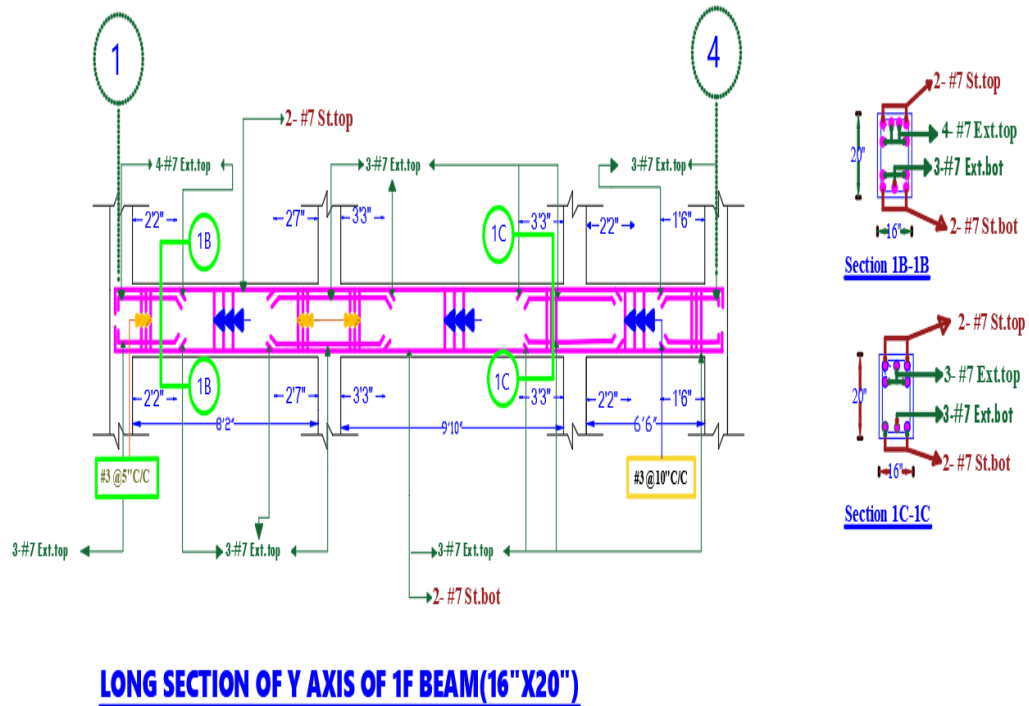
Long and Cross Sections of Y Axis of 1<sup>st</sup> Floor Beam (16" X 20")
